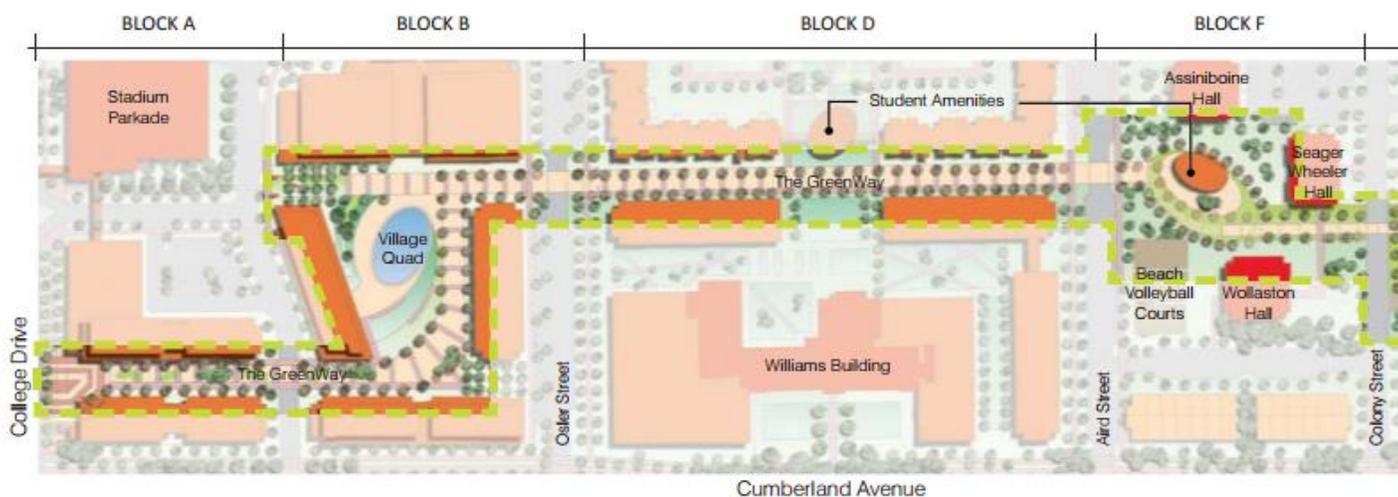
Campus Quarters master plan concept of the GreenWay (CQ Master Plan, 2010)
